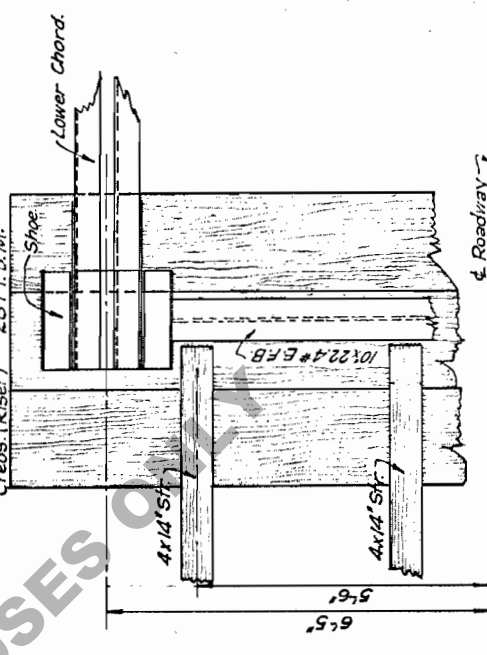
DETAIL OF METHOD OF BUILDING UP PIER FOR BULKHEAD WHERE STEEL DOES NOT CONNECT WITH TIMBER PANEL.
